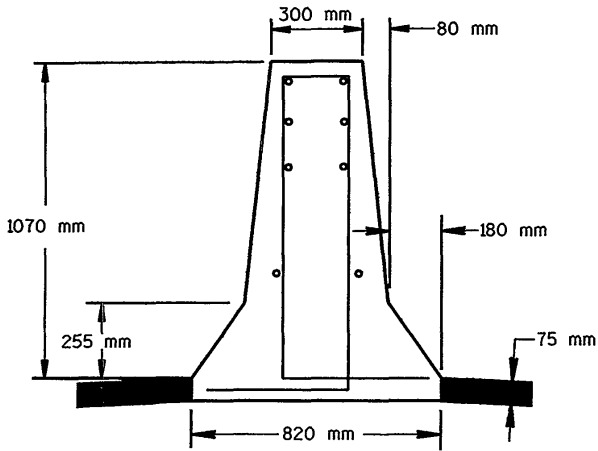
Tall Wall Concrete Safety Shape (Reinforced)
